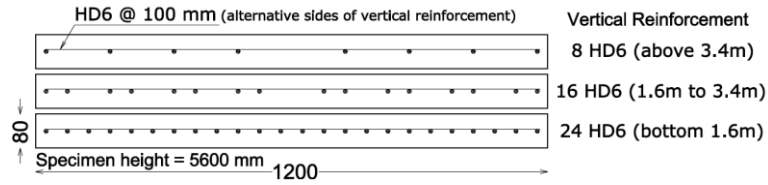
Cross section and reinforcement layout of Specimen 3 (Beattie 2004)
